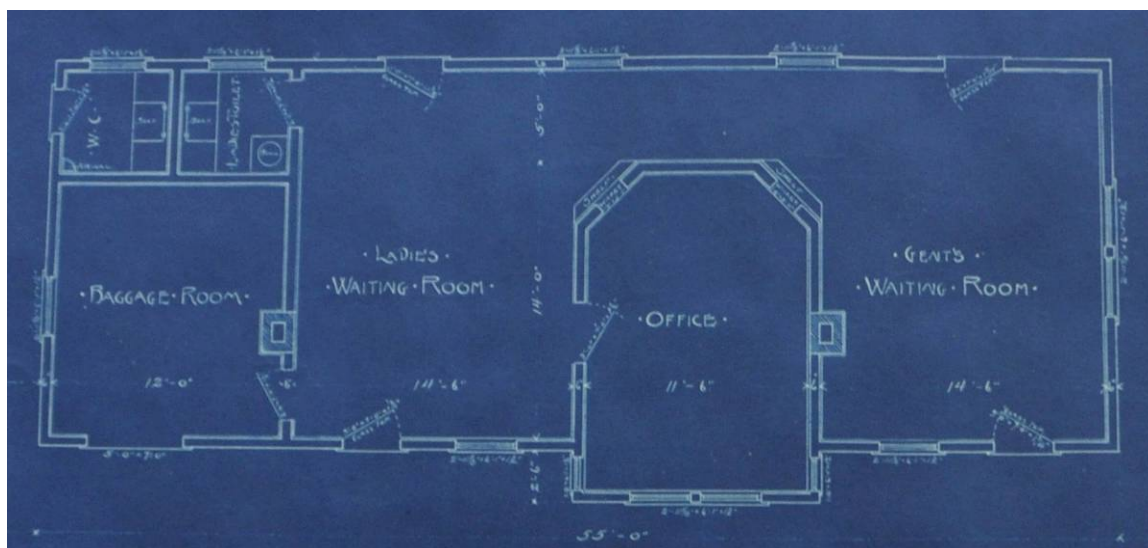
Floor plan of Dixfield/West Peru passenger station, designed by Edwin Lewis. It adhered to standard conventions and contained separate waiting rooms for men and women as well as separate lavatories. It also had two stoves. [Courtesy MHPC]
